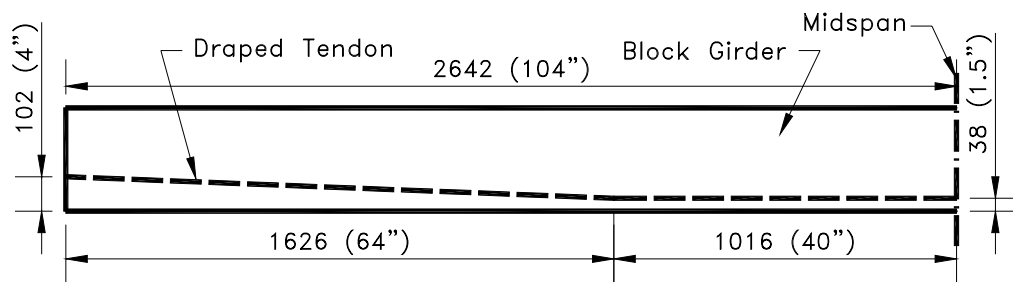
Half Longitudinal Section of Girder showing Draped Tendon
